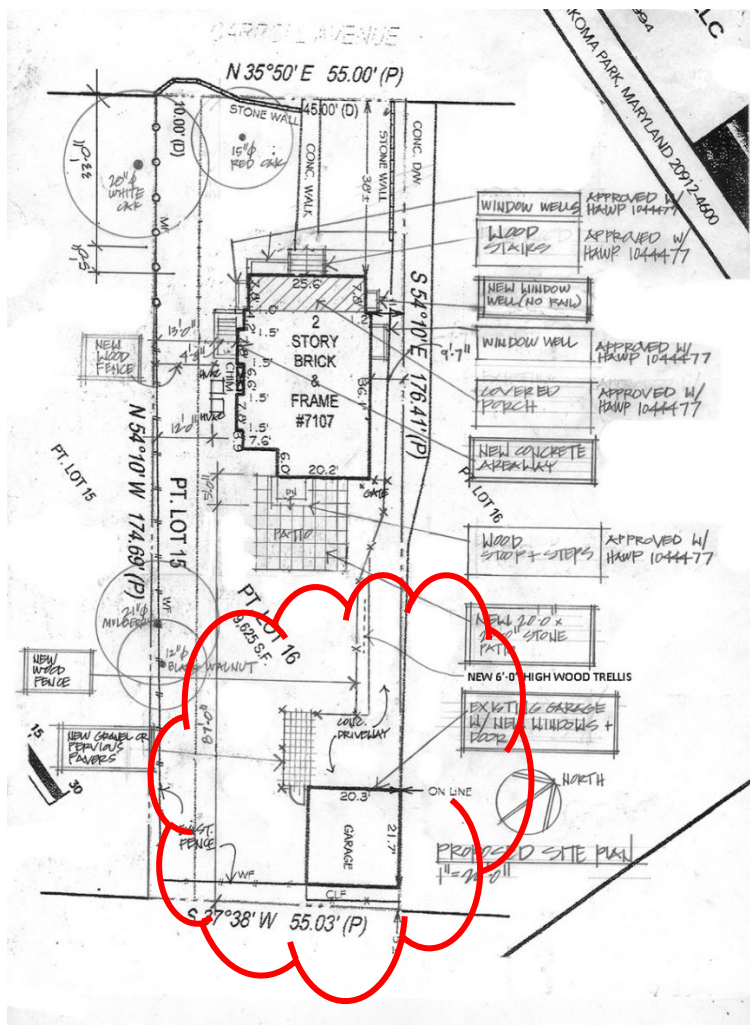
The locations where the driveway will be reduced in size and permeable pavers or gravel added are clouded in red.
